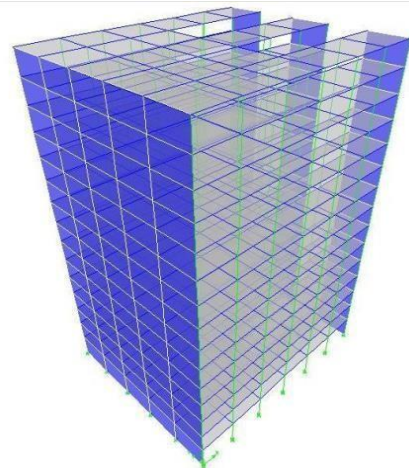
E-Shaped model with Flat Slab and Shear Wall at Alternate Periphery
